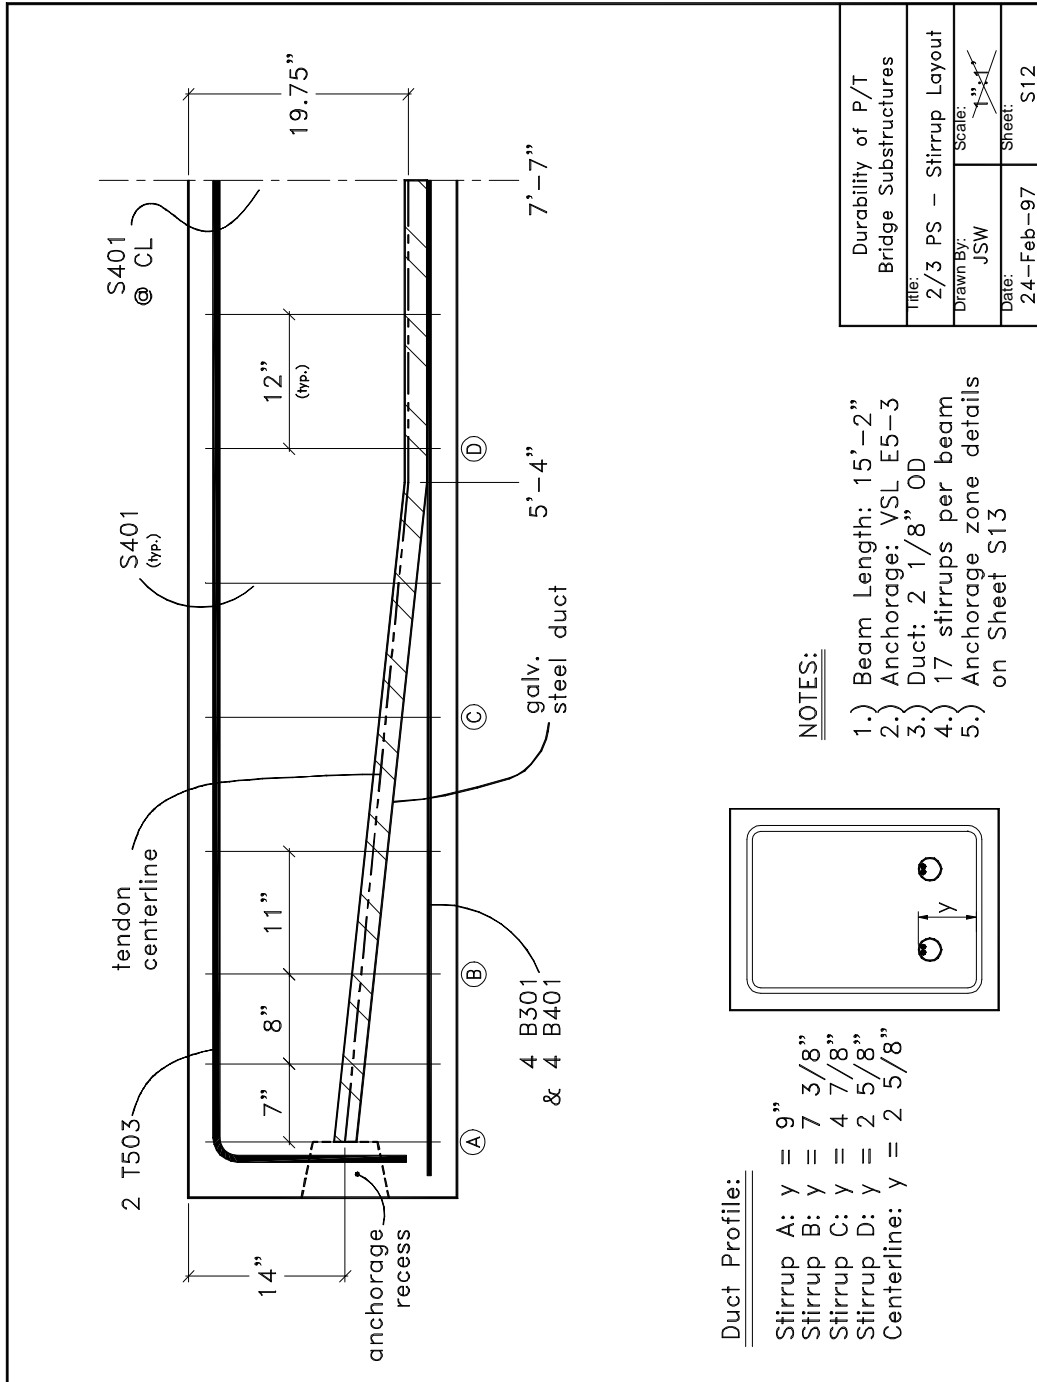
Sheet S12: 2/3 PS Stirrup Layout
